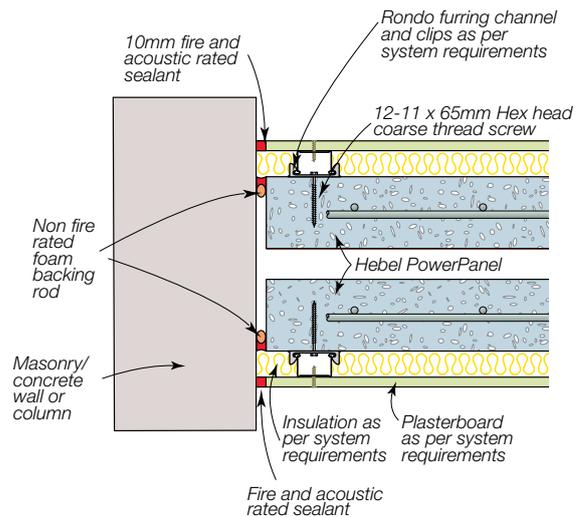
Corner junction - Intertency Walls or Common Walls Option 2
